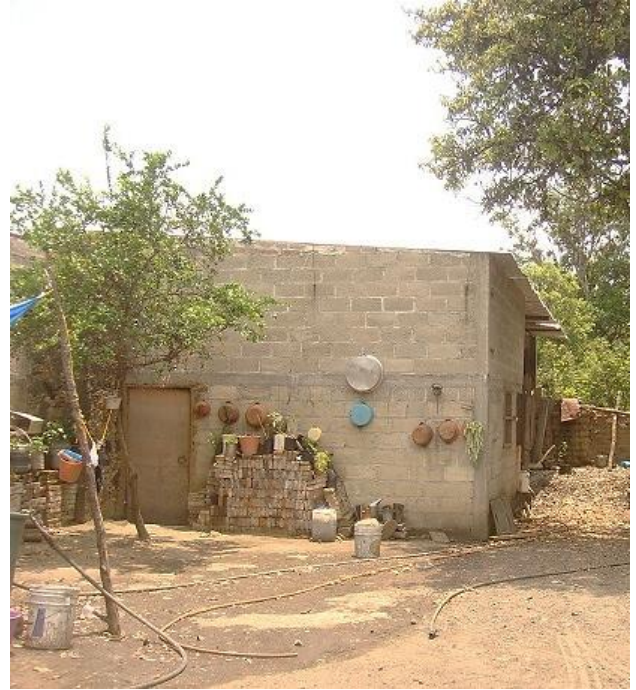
Access to the property, where the roof of beams and brick is observed
